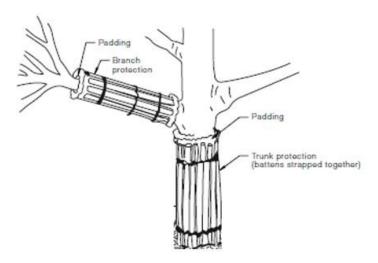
Example of trunk and branch protection (Source: AS 4970-2009).
